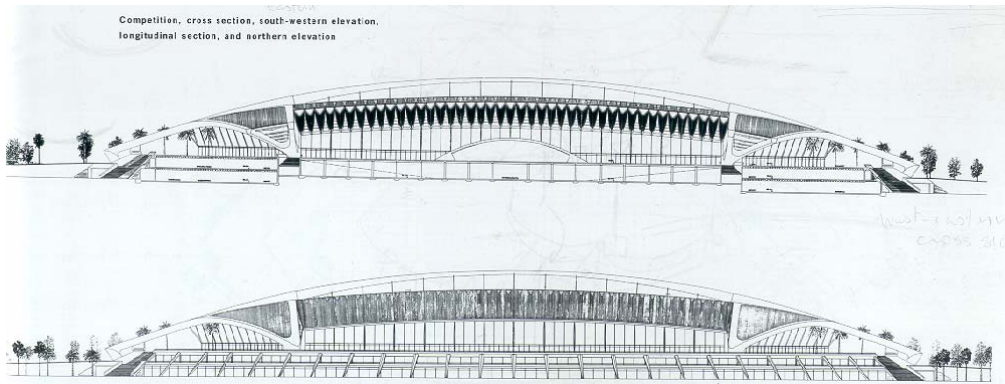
Longitudinal façade and cross-section, Tenerife Exhibition Center, 1992
